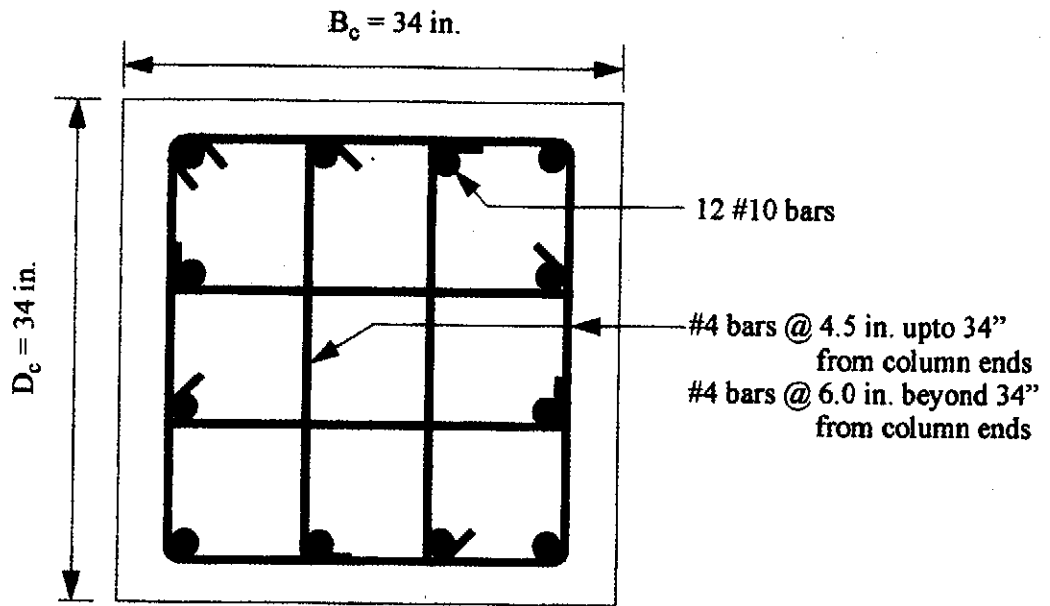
Reinforcement details for column 3 (between grade and floor 2) and column 4 (between floor 2 and floor 3)
